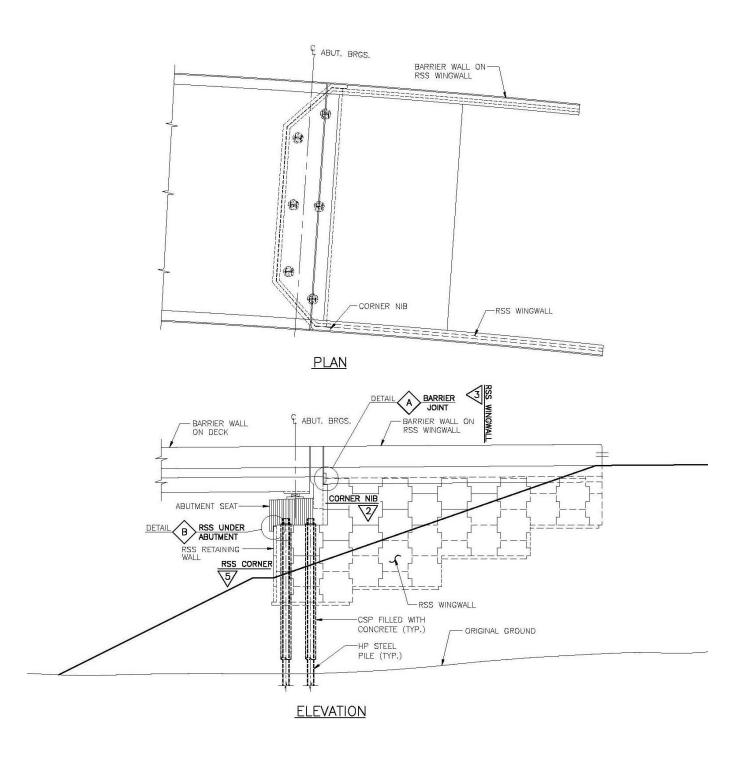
RSS False Abutment (Under Stub Abutment) with RSS Wingwalls. For Section 2, 3 and 5, see Figures 5.11, 5.1 and 5.15 respectively. For Detail A and B, see Figures 5.14 and 5.10 respectively.
